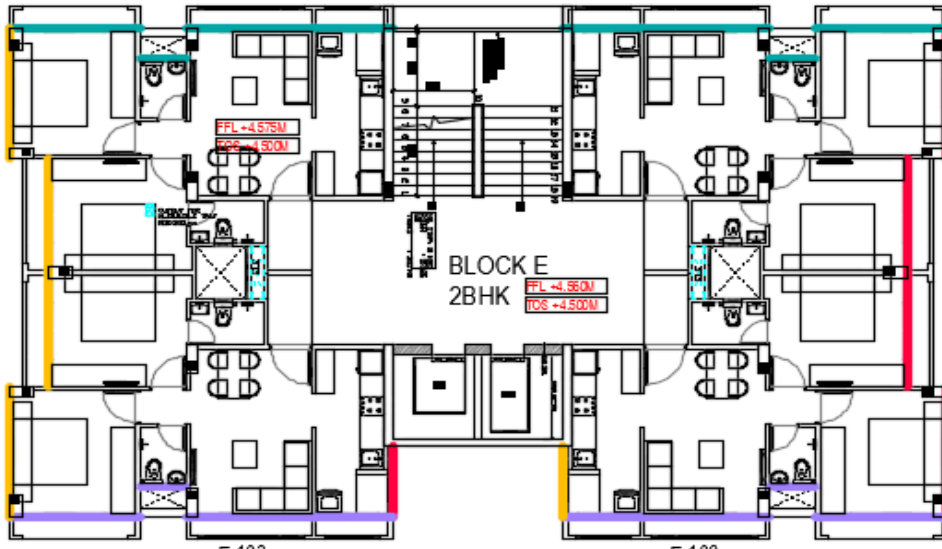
Typical Floor Plan (Aarambh Housing, Ahmedabad, Gujarat)
